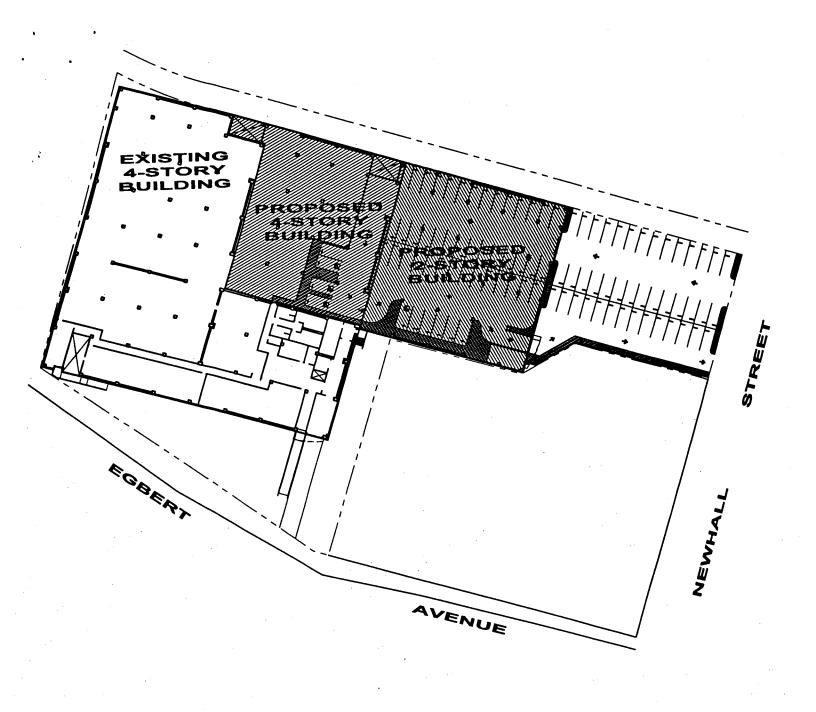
Phase 1-Site Plan (Under Construction)
